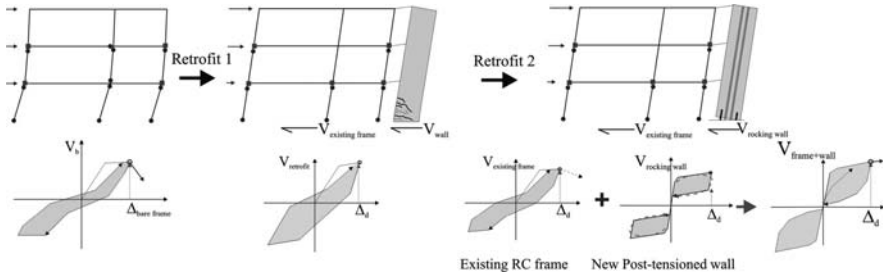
Retrofit solutions using a typical external cast-in-situ walls or a rocking/dissipative post-tensioned wall (modified after [37])
